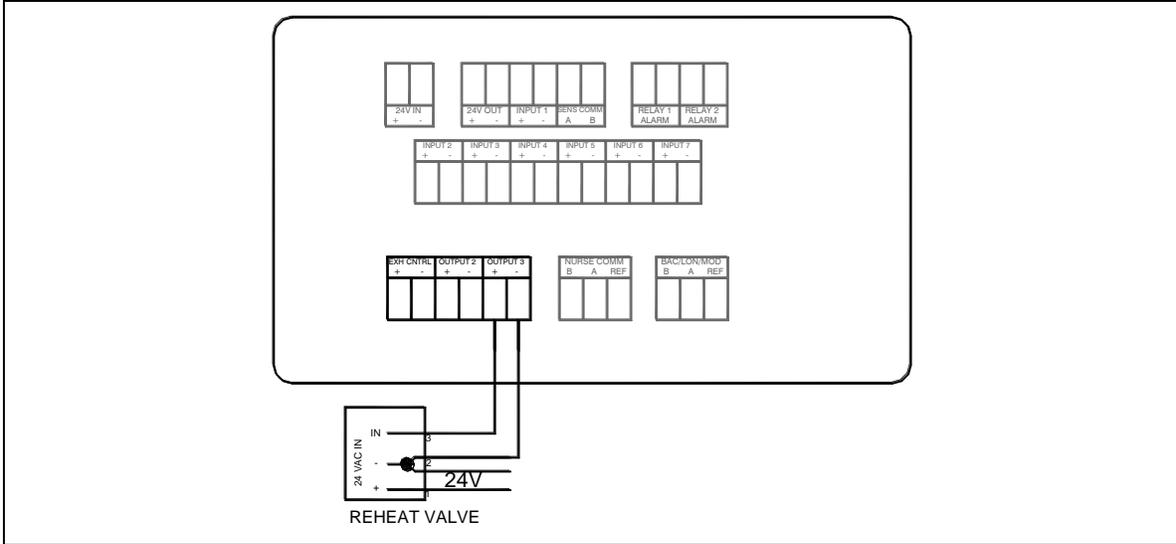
Optional Reheat Actuator Wiring to Model RPC30.
